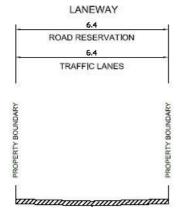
(f) Port Sorell and Environs Street Cross-section designs - Laneway
